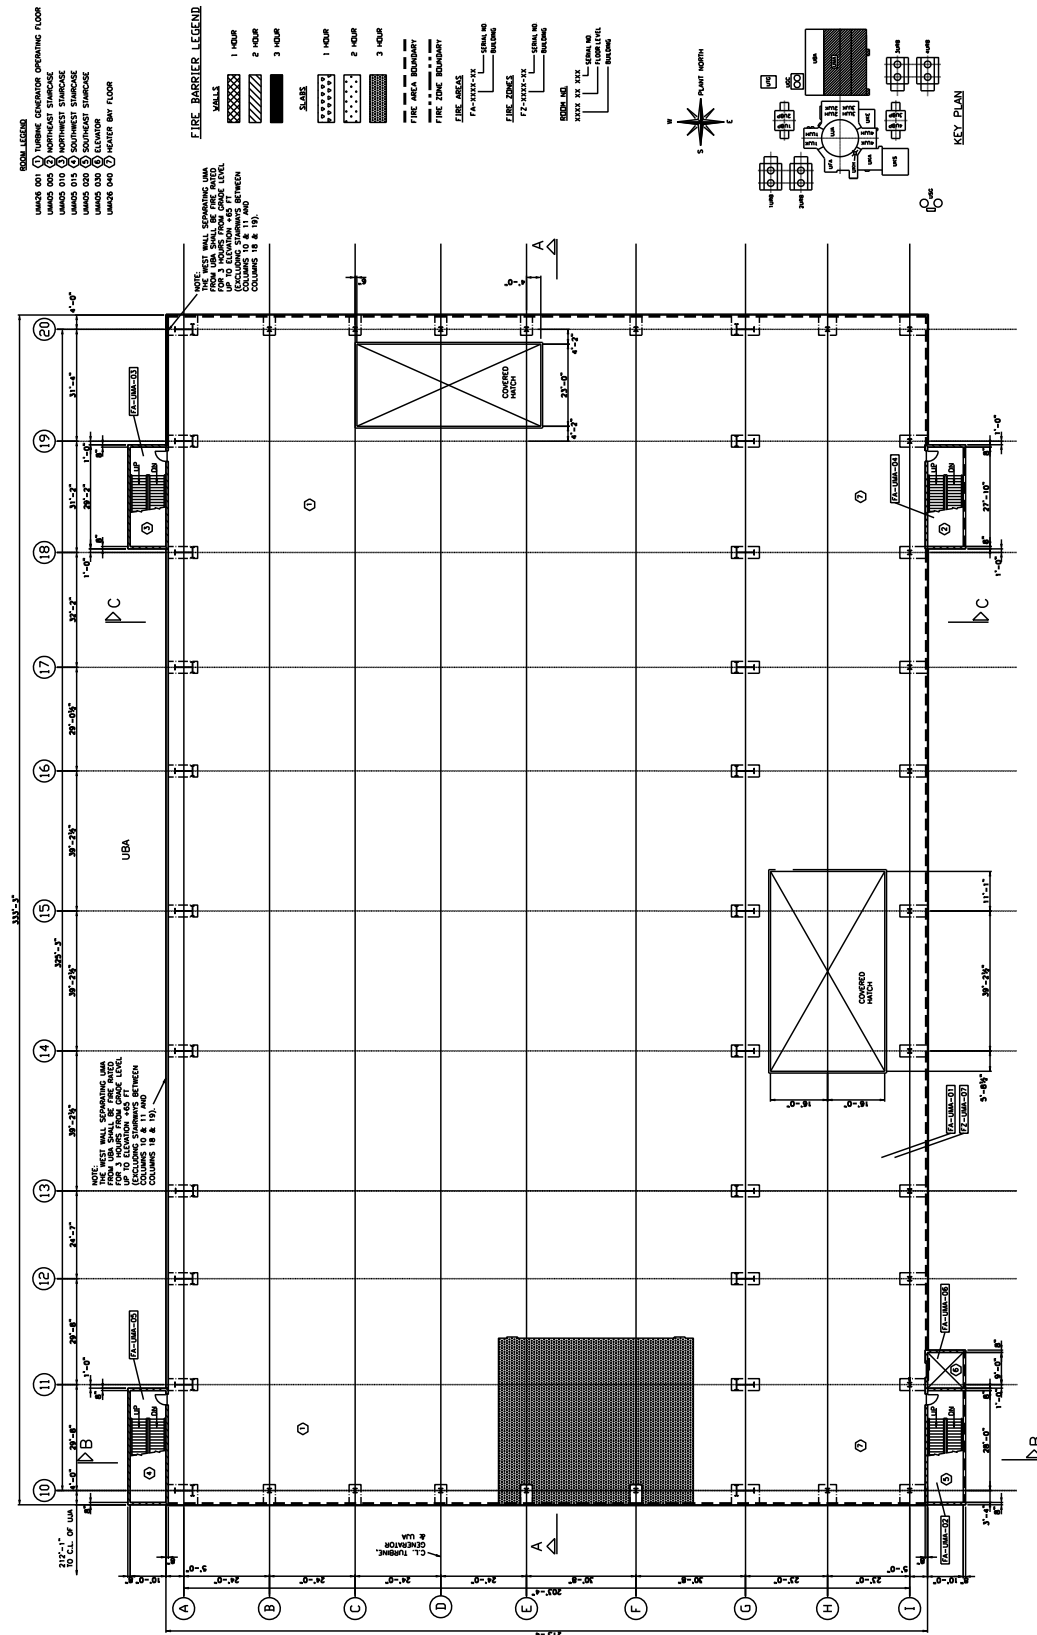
B-5— {Fire Barrier Location, Turbine Building Plan at Elevation (-)43 ft}
